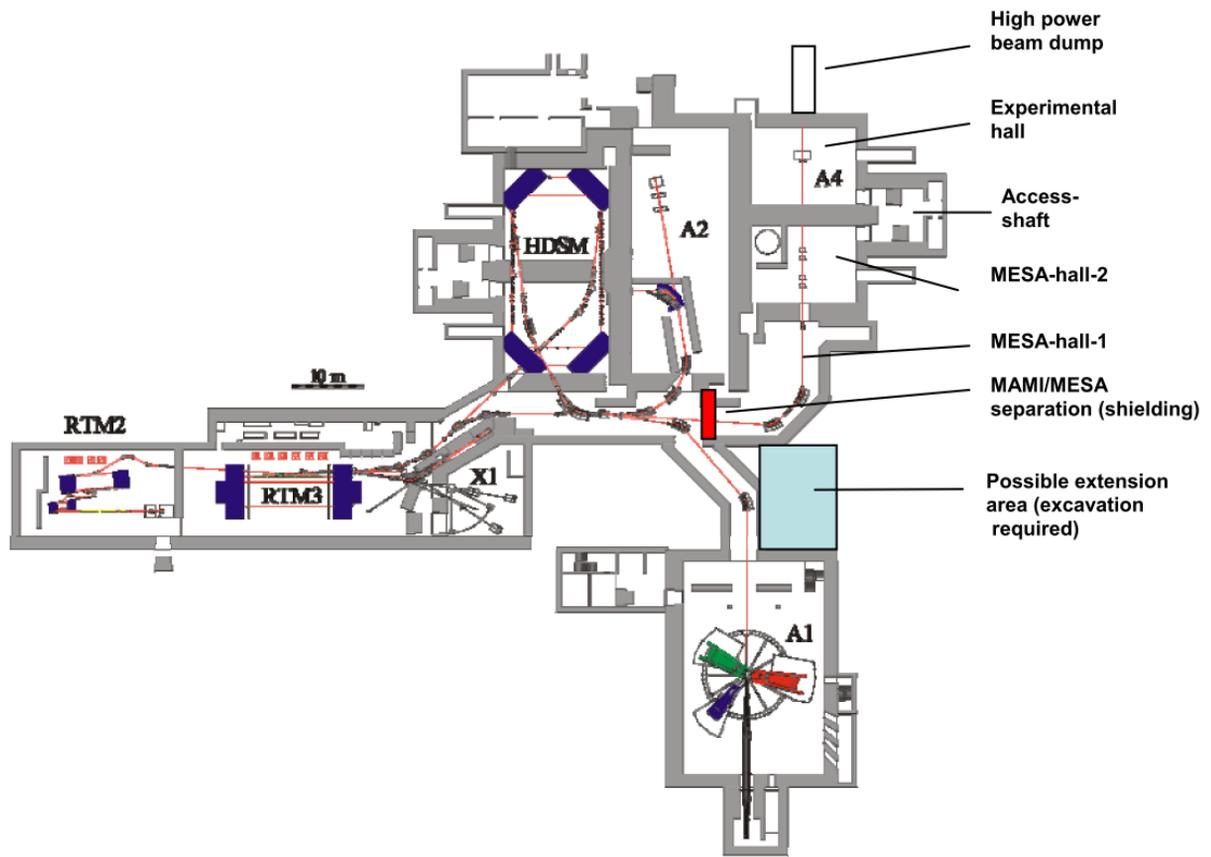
MAMI-C floor plan with experimental halls. The former beamline tunnel (Mesa-Hall-1) and the former Halls 3 (MESA-Hall-2) and Hall 4 (A4) will be available for the installation of MESA and its experiments.
